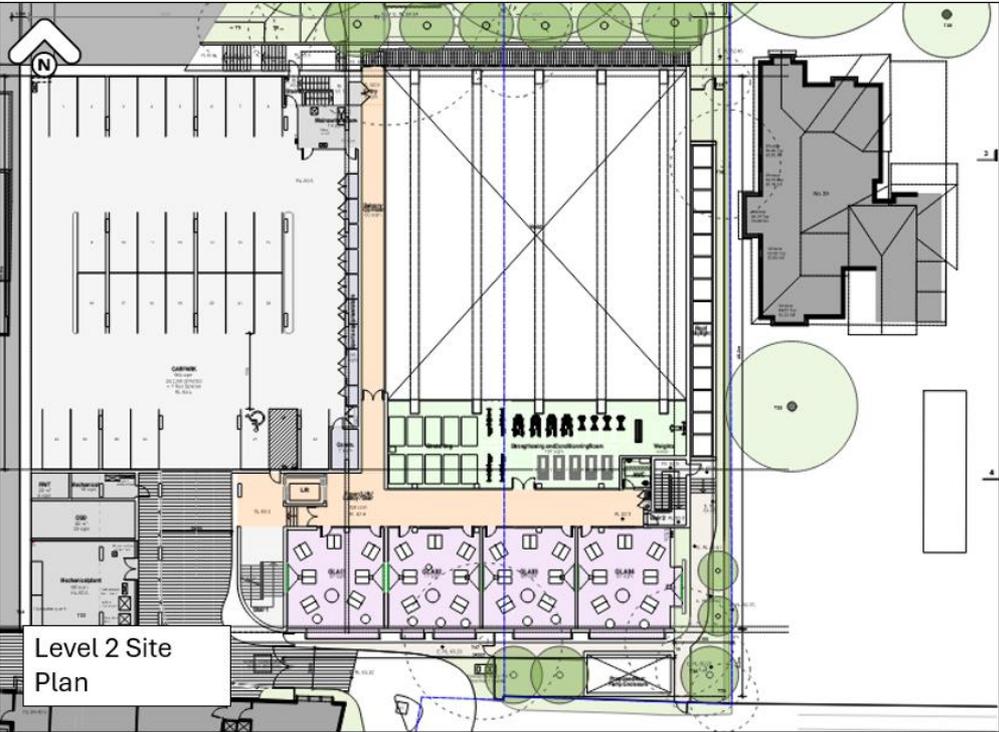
Level 2 Floor Plan of the Swell Centre Development
